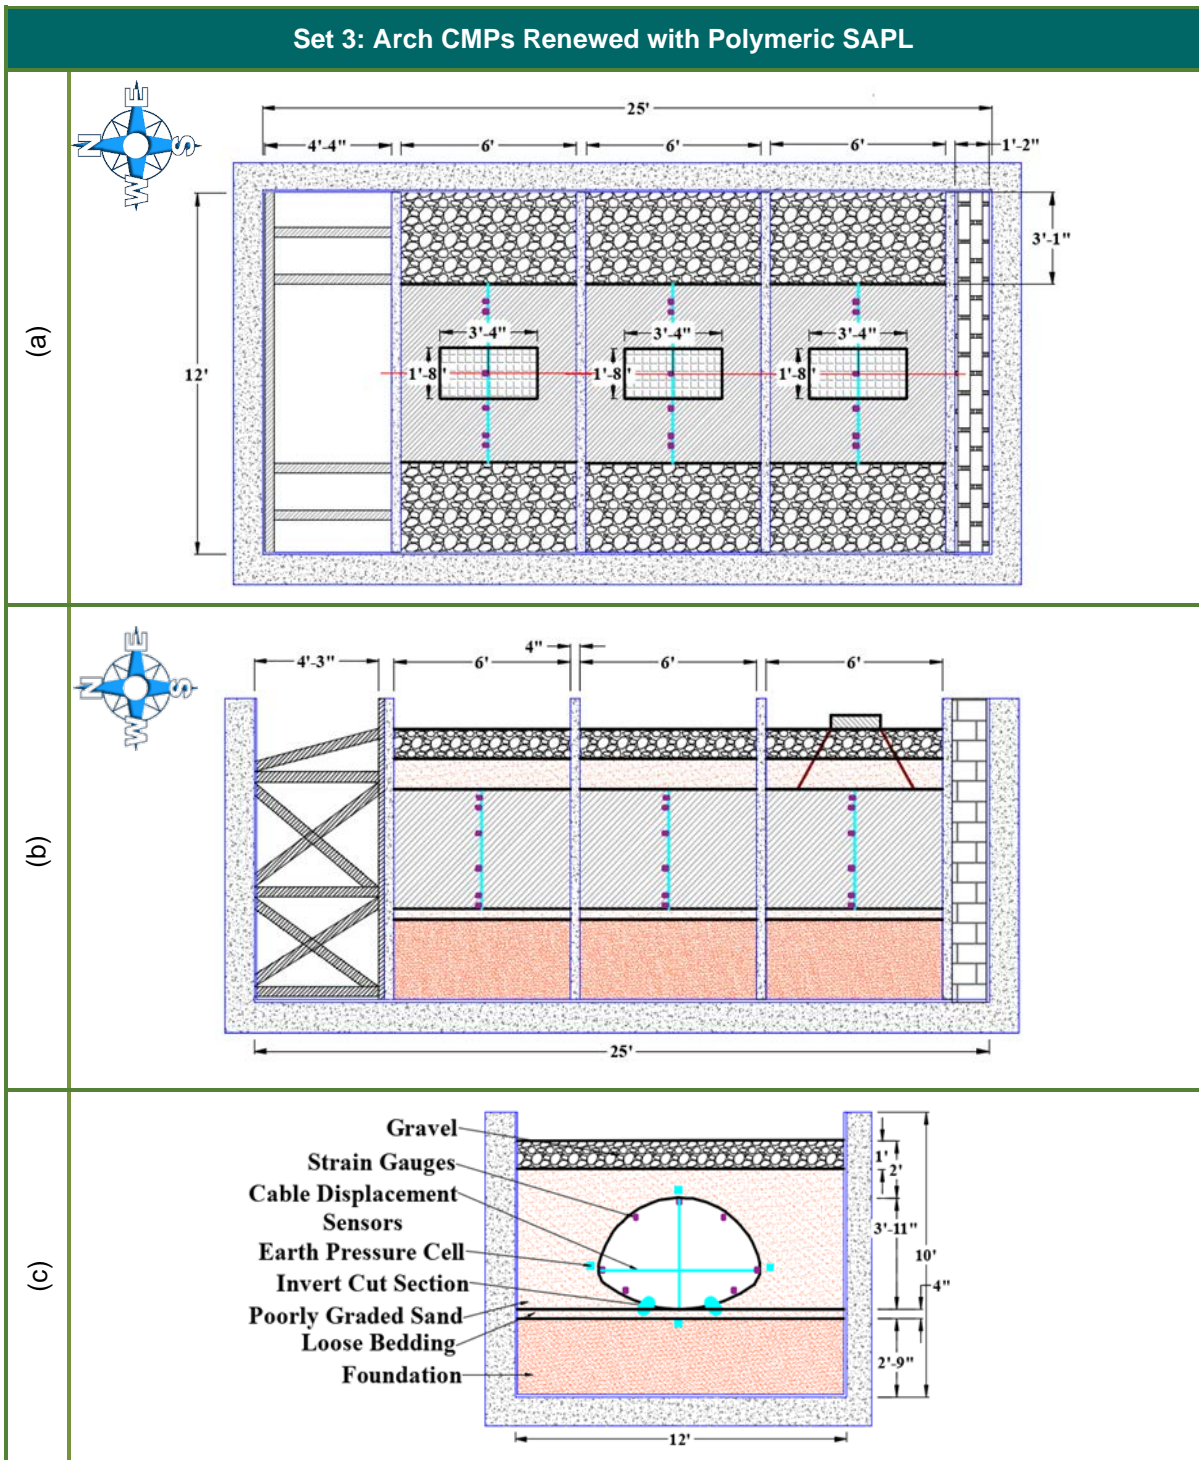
The arch CMPs' burial configuration (3<sup>rd</sup> set of soil box testing): (a) plan view, (b) profile view of the aligned arch CMPs in the soil-box, and (c) cross sectional view of the arch CMP.
